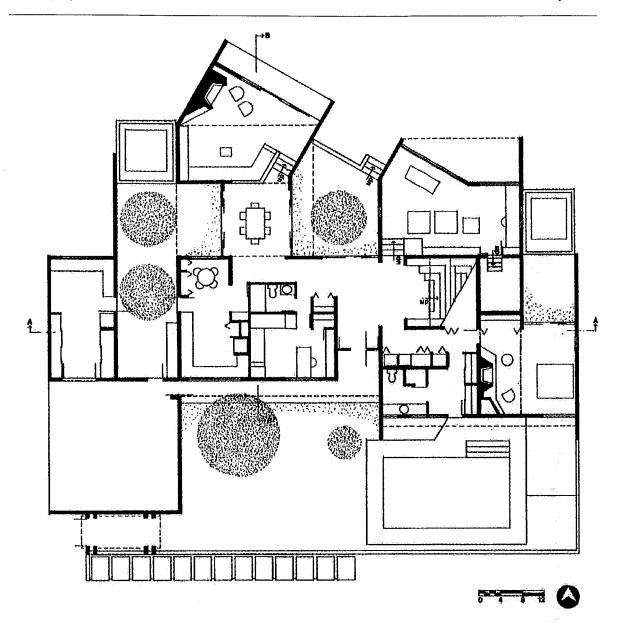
Jacobson House, floor plan.. Published in Powerhouse, 2019.
